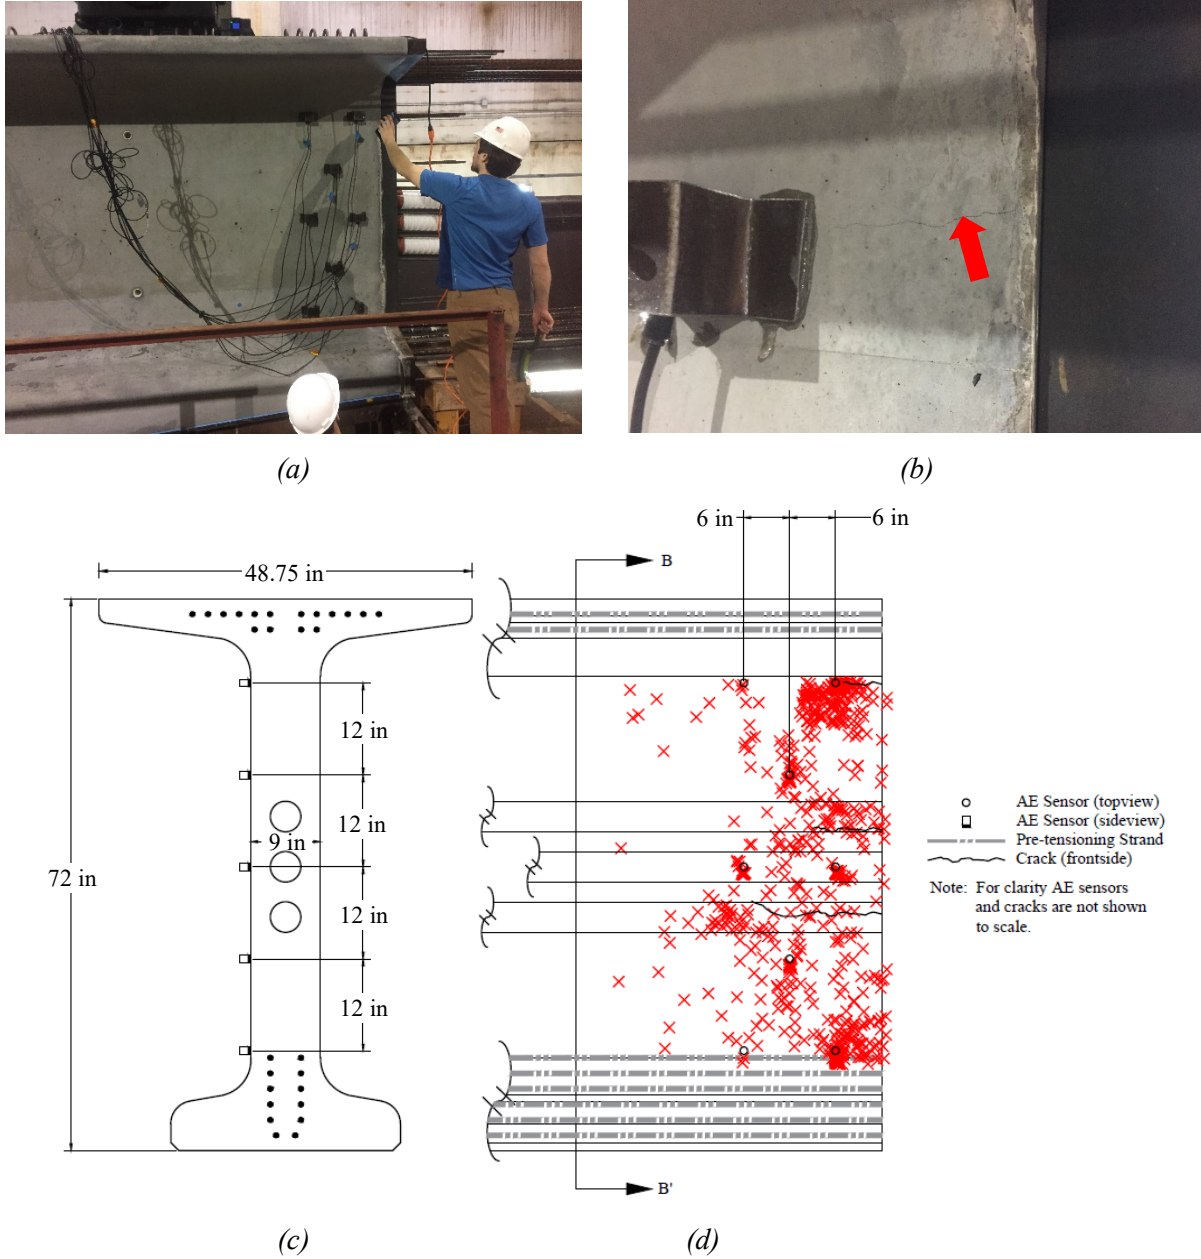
Hammerhead Bulb Tee girder 2D sensor array field testing of detensioning with 960 recorded events (a) AE equipment/sensor setup, (b) observed horizontal web crack, (c) section view of Bulb Tee beam, and (d) profile view of Bulb Tee girder
